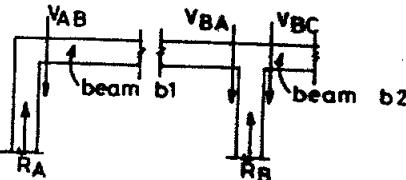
(a) Slab End Shears as Loads on Beams
